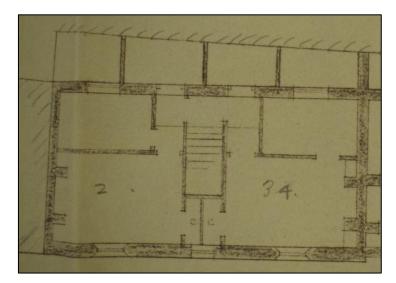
Probable original 1st floor layout (No. 1 Magdalene Lane) (SWHT Ref. D/B/ta/24/1/79/1648)
